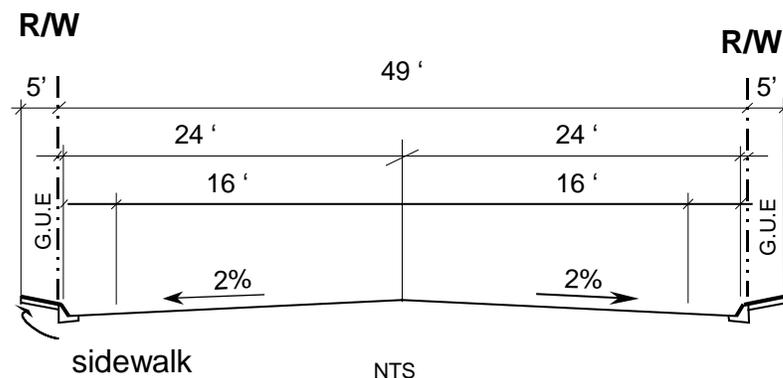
COMMERCIAL AND INDUSTRIAL STREET – TYPICAL SECTION
